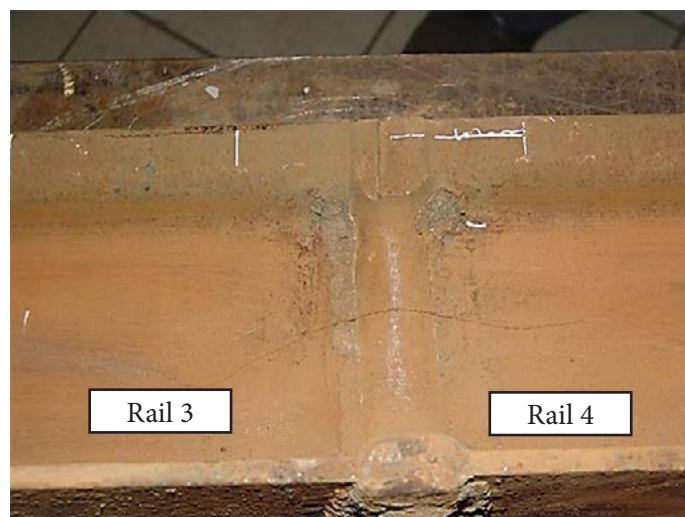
Fatigue crack in joint S2 of rail 3 and 4
